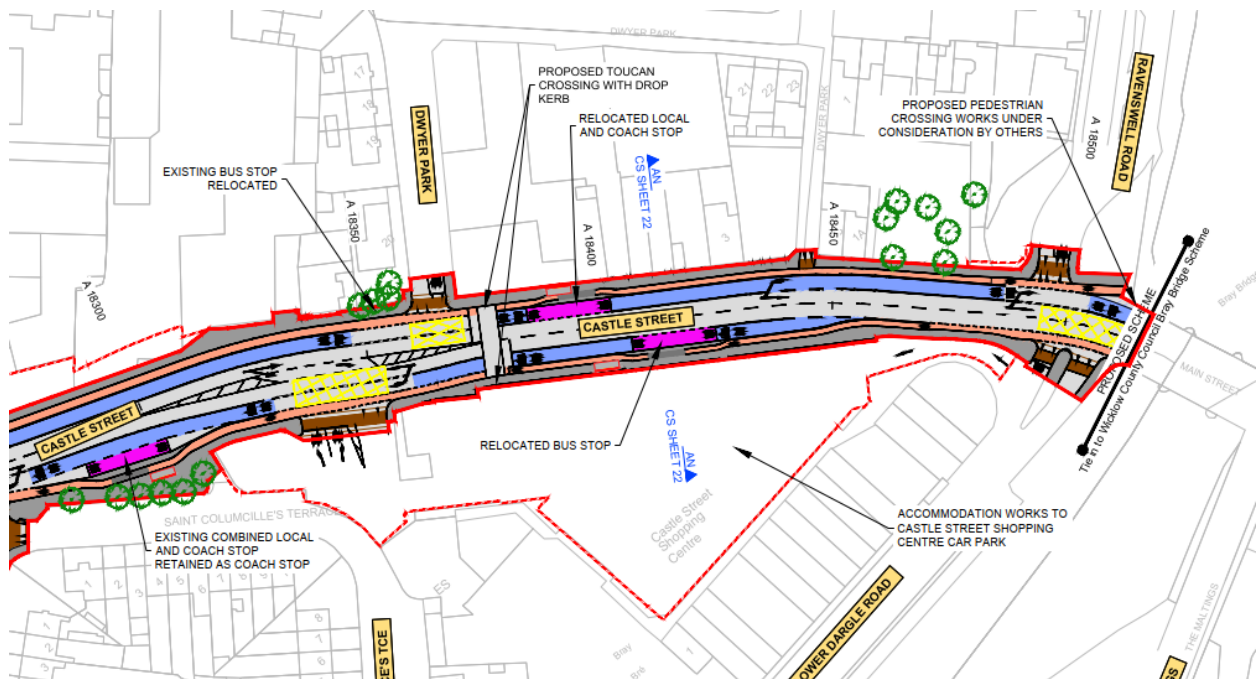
Proposed Scheme Cross-Section along Castle Street, Bray
